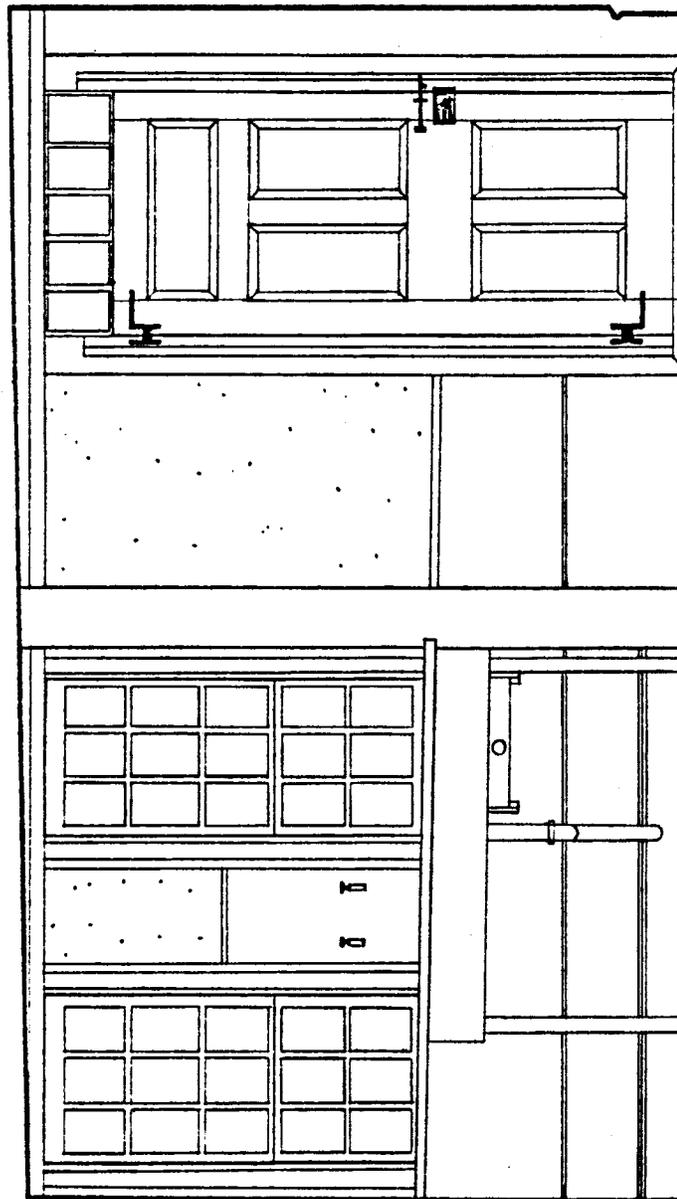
Atwood-Higgins House: East Kitchen, North Wall.
